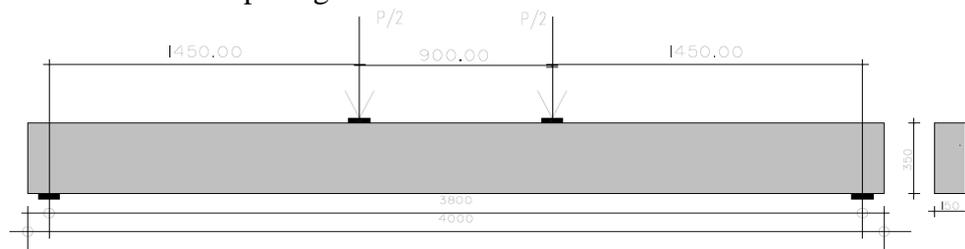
Concrete dimensions and cable profile of prestressed beams
